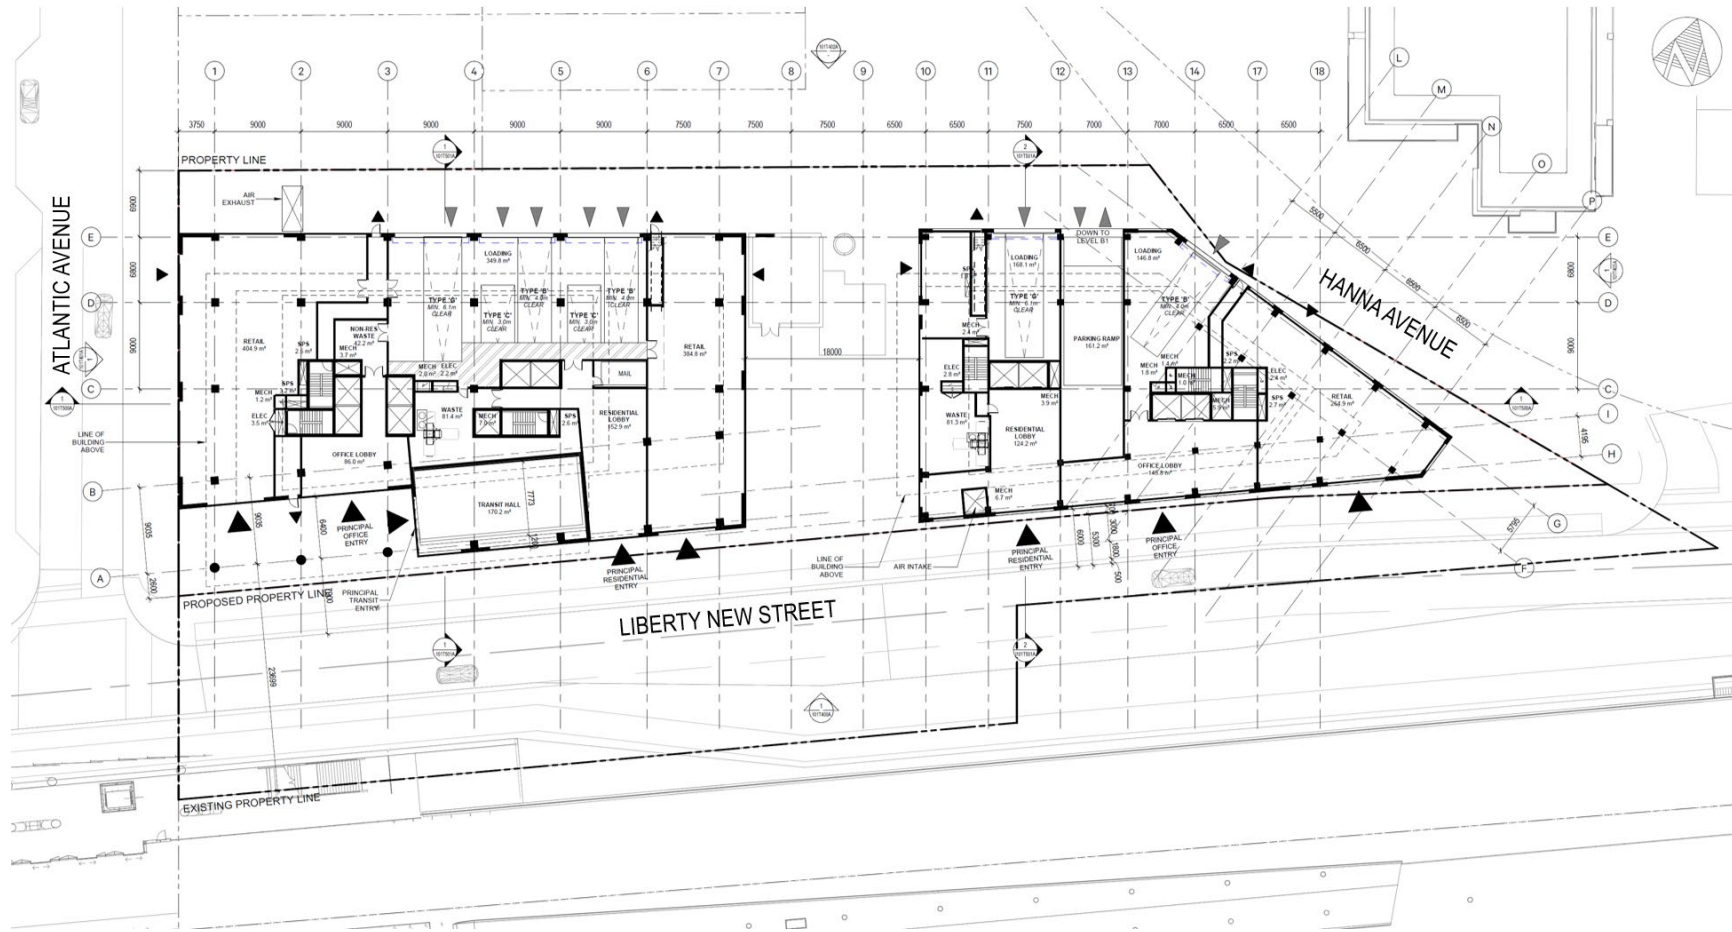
Site A (1-1A Atlantic Avenue) Site Plan
